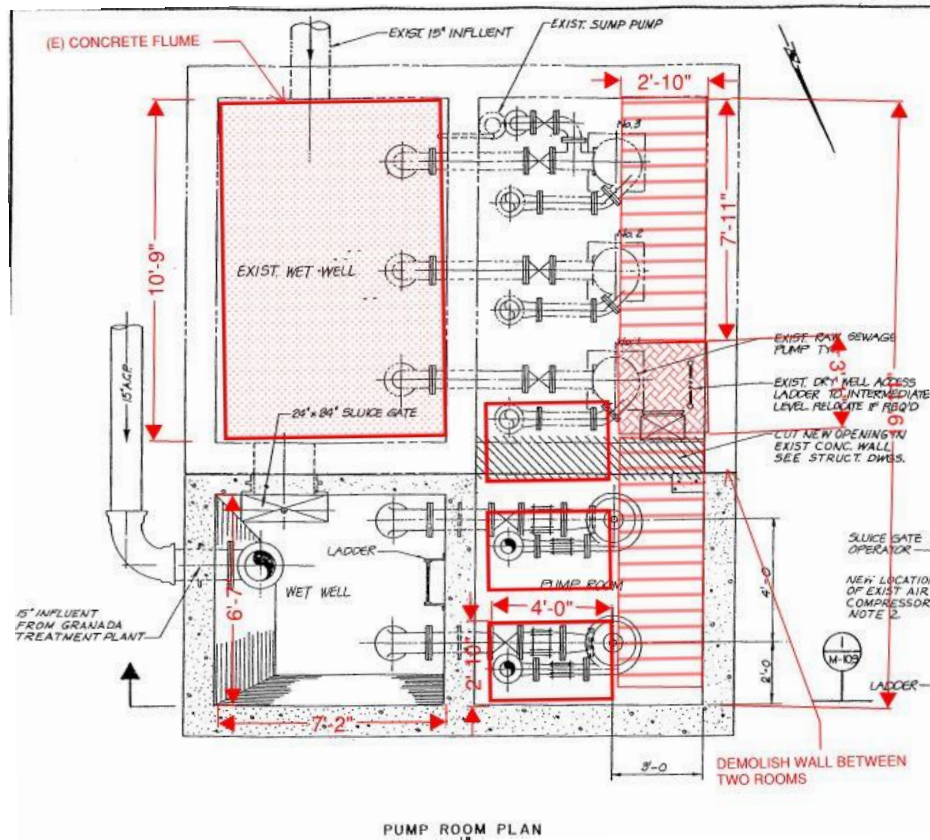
Alternative 2 Dry Pit Submersible Pumps and Stairway
